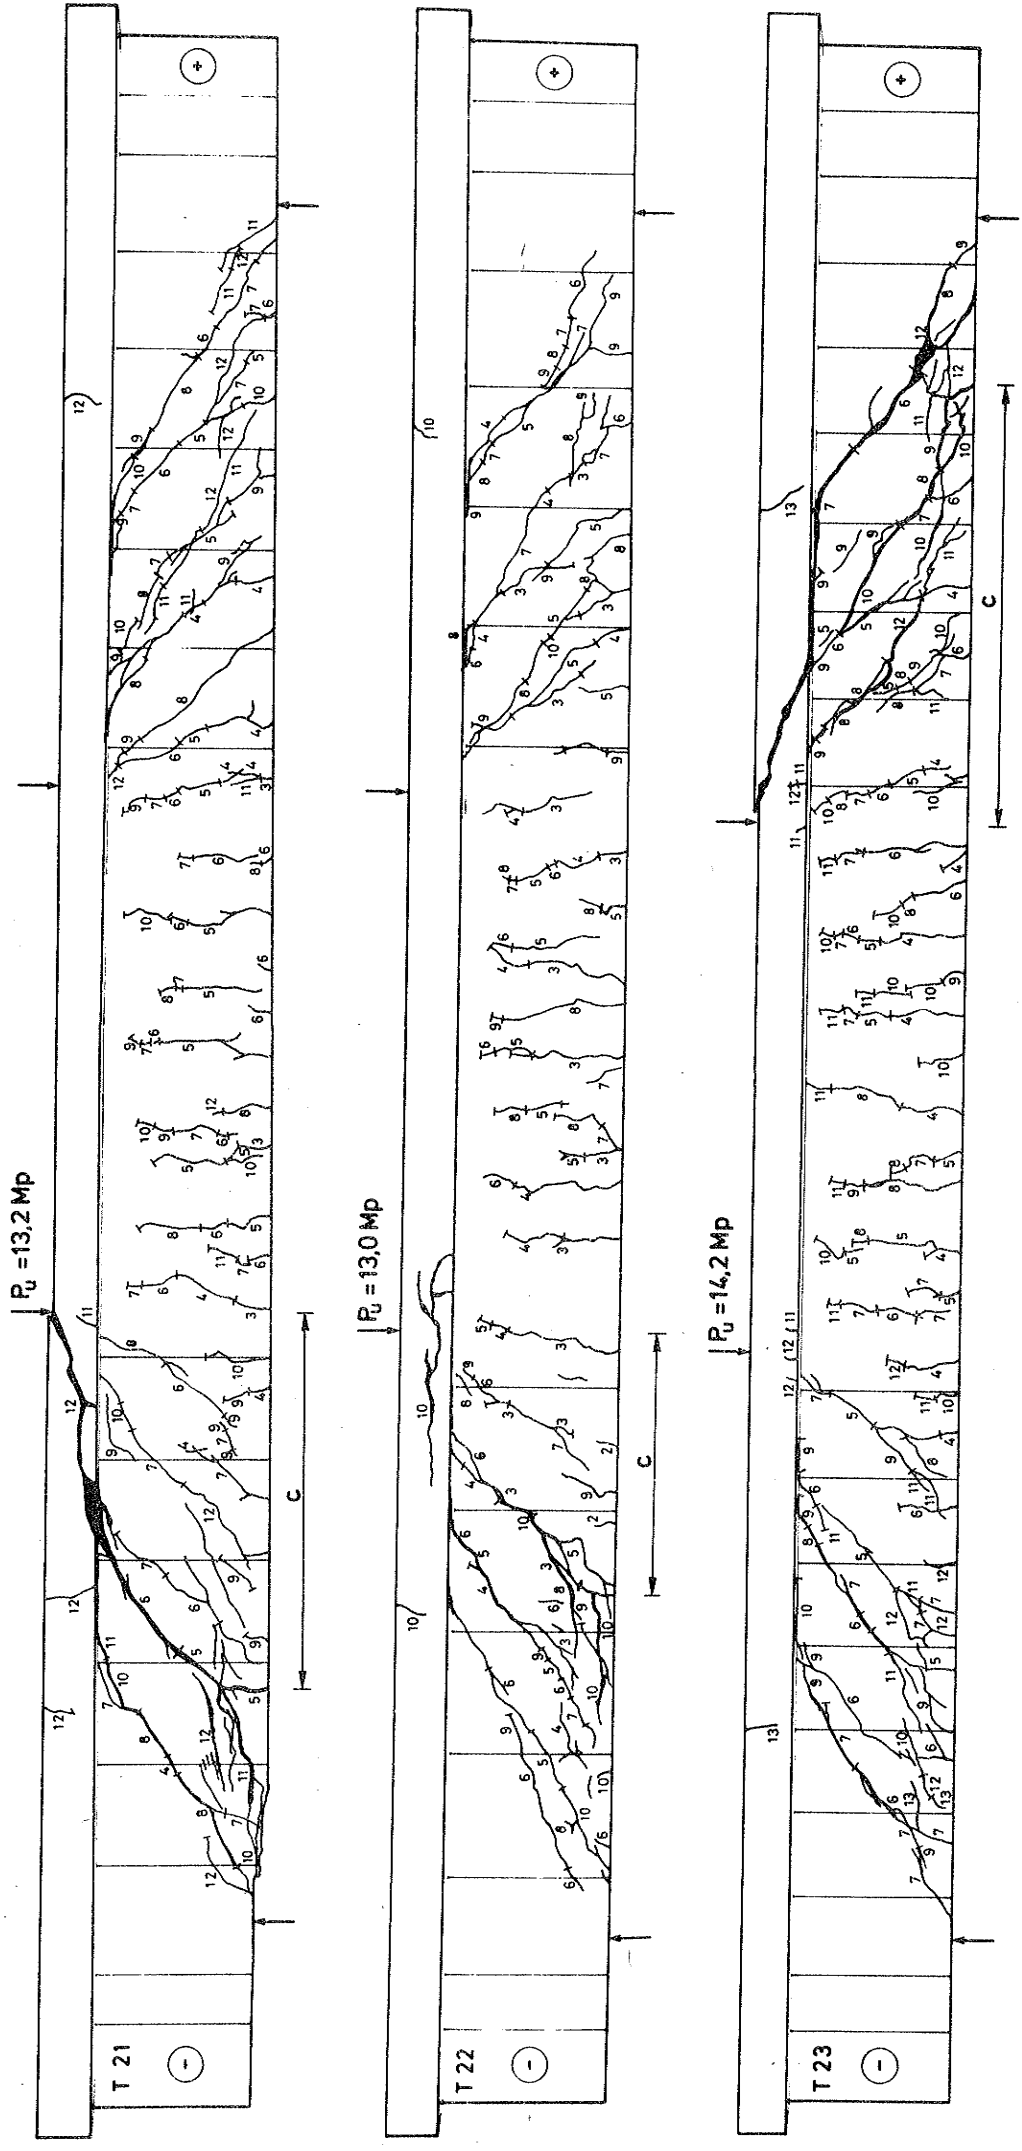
Crack pattern after failure, beam T21, T22, T23
